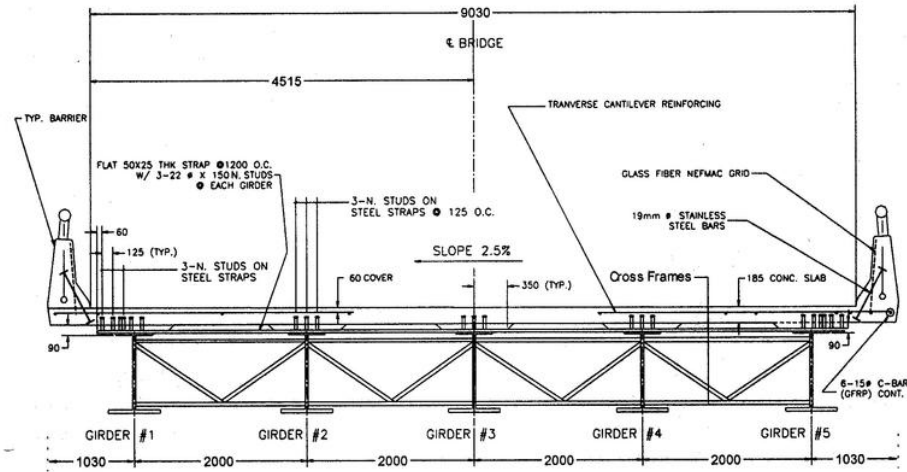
Cross Section of Crowchild Bridge (Excerpted from [9])
